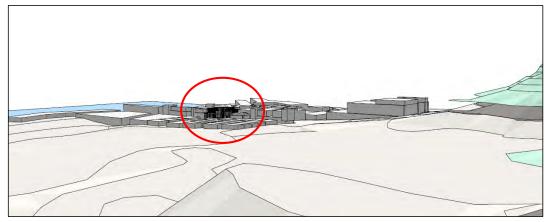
North-east building view extracted from Town Centre Model (proposed building in red)
